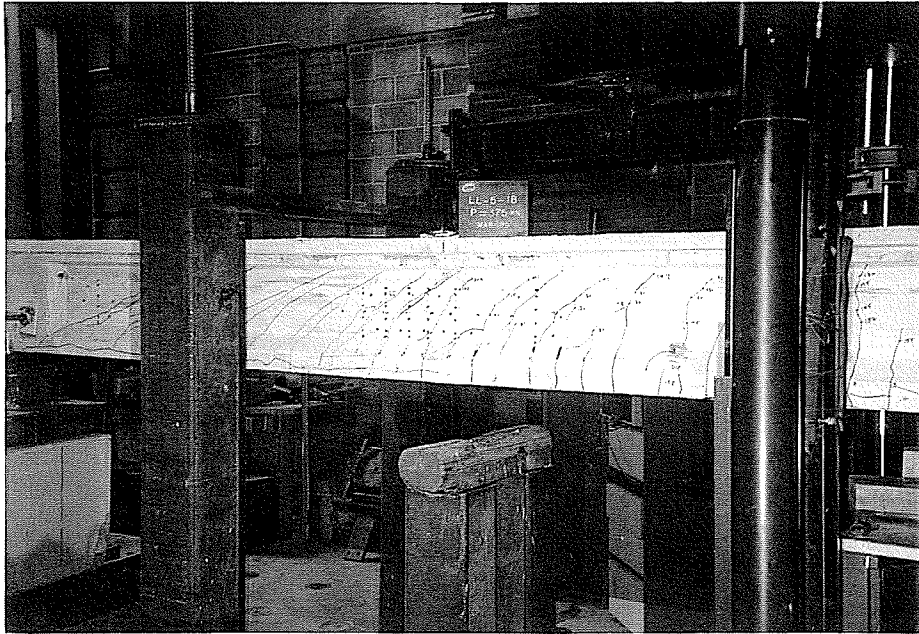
Steel frame jacked to the floor used to enhance the safety at failure stage
